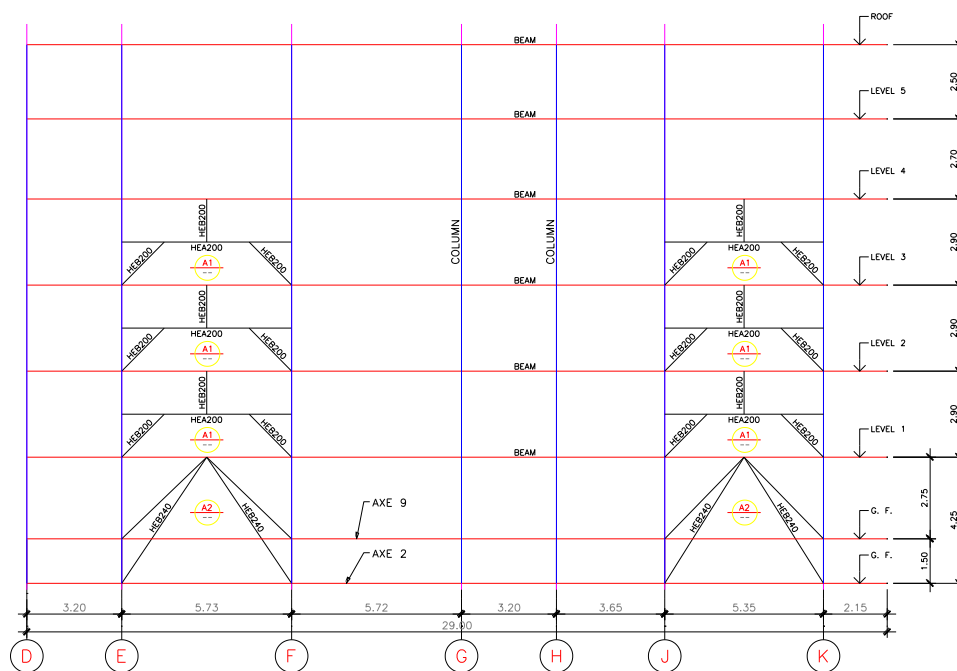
Elevation of reinforced frames 2 and 9 in the East Unit
